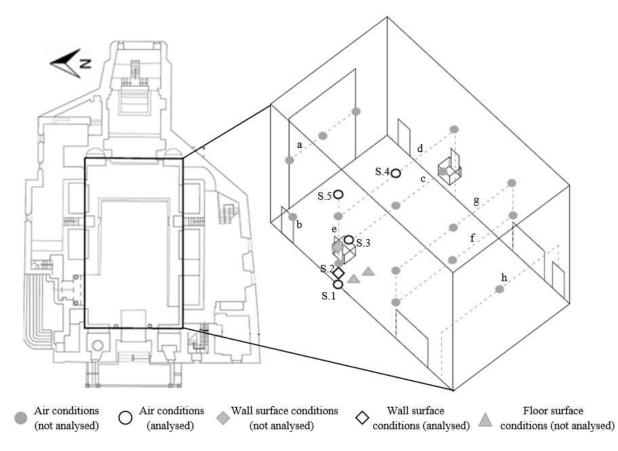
Horizontal plan of the church of São Cristóvão and location of the T and RH sensors in the nave
